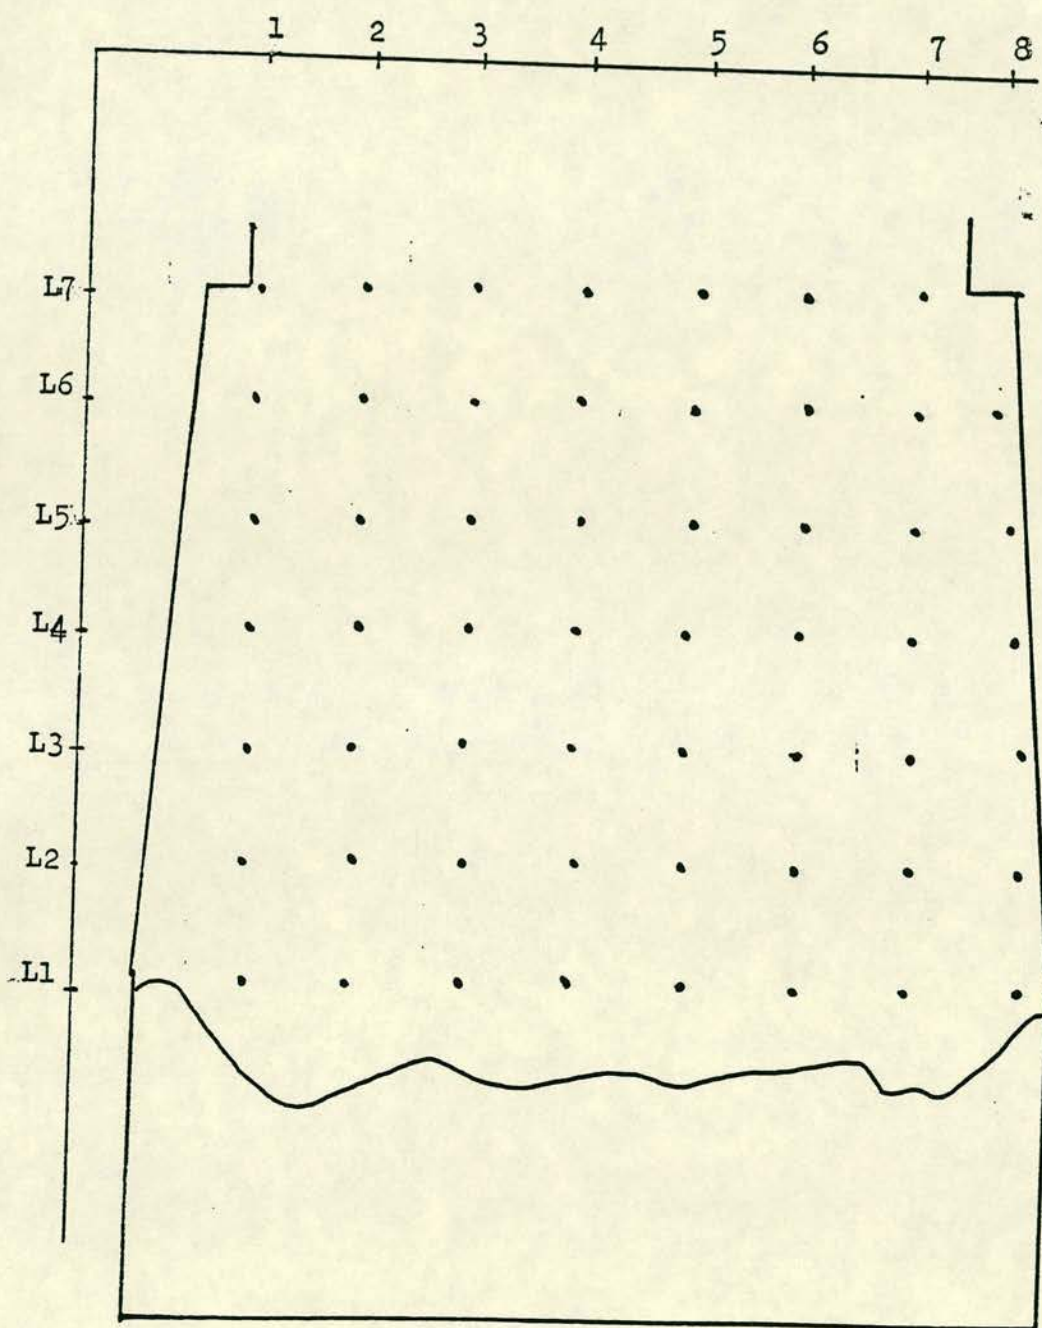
High Bridge - Struie - west abutment, location of reflection test points
